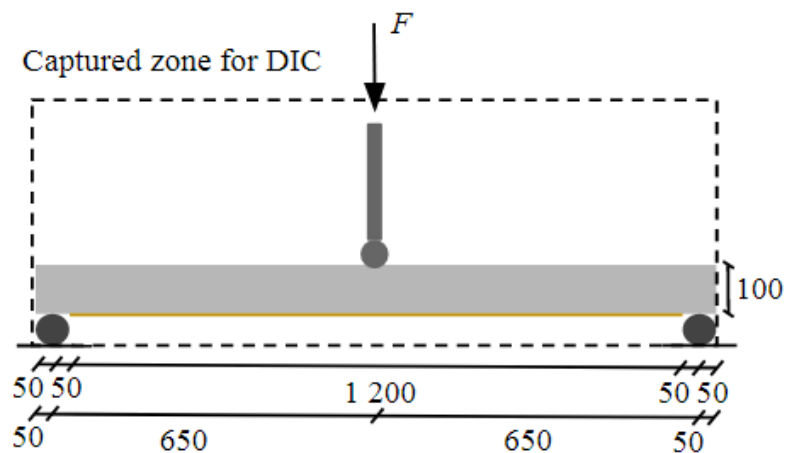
Illustration showing schematic figure of the test set-up and dimensions [mm] for static testing.
